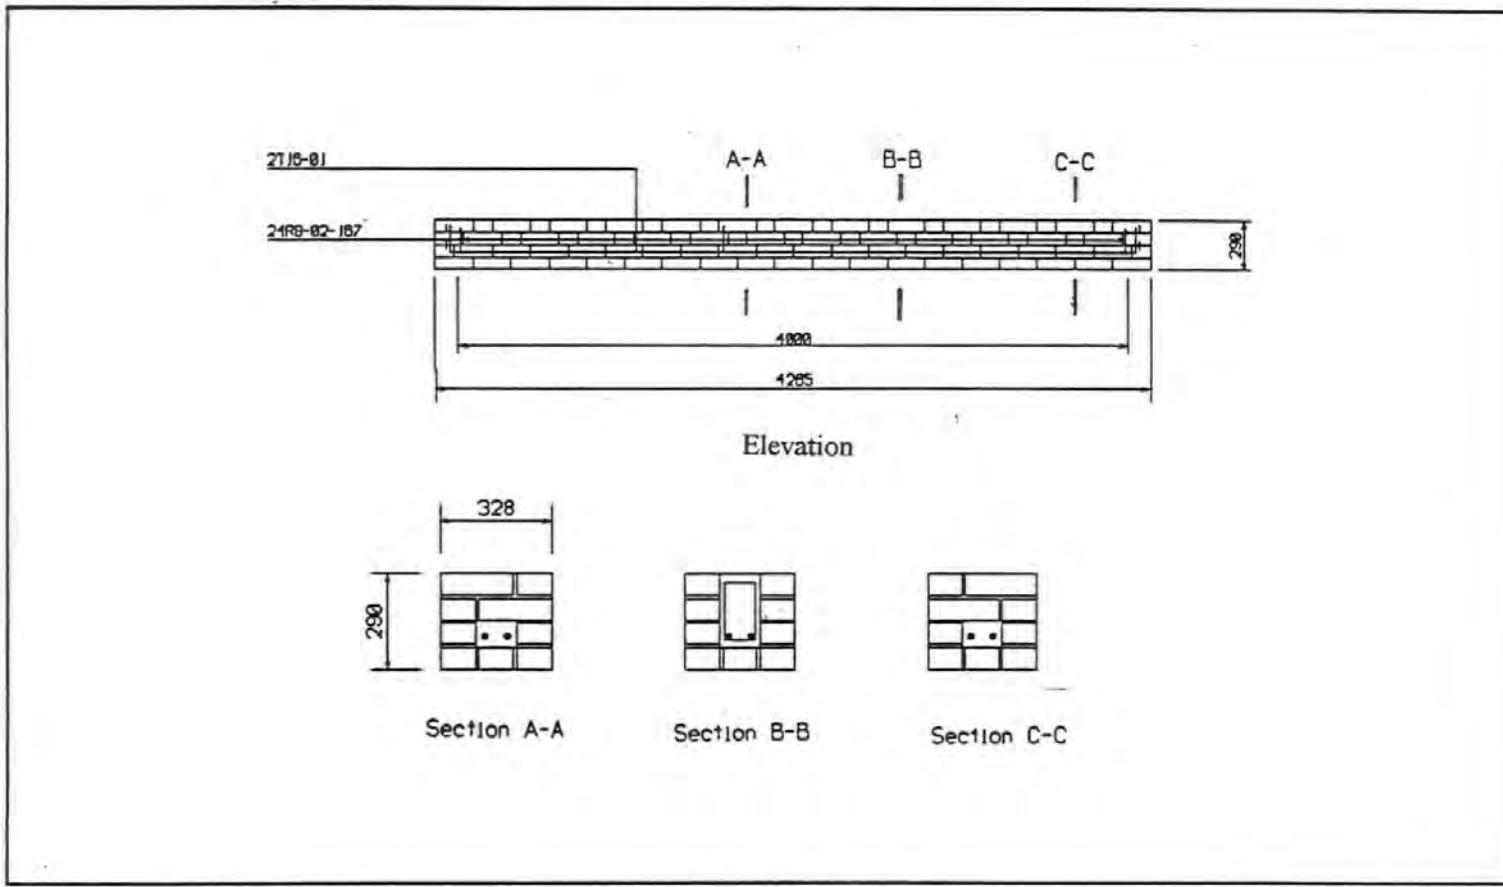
UOP Quetta Style Test Beam, 4m span
